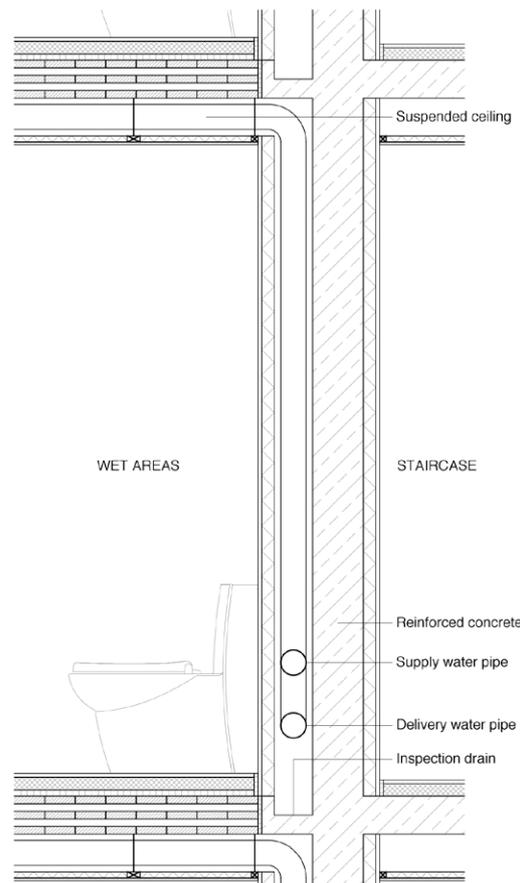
Hydraulic shaft detailing for CLT Construction
